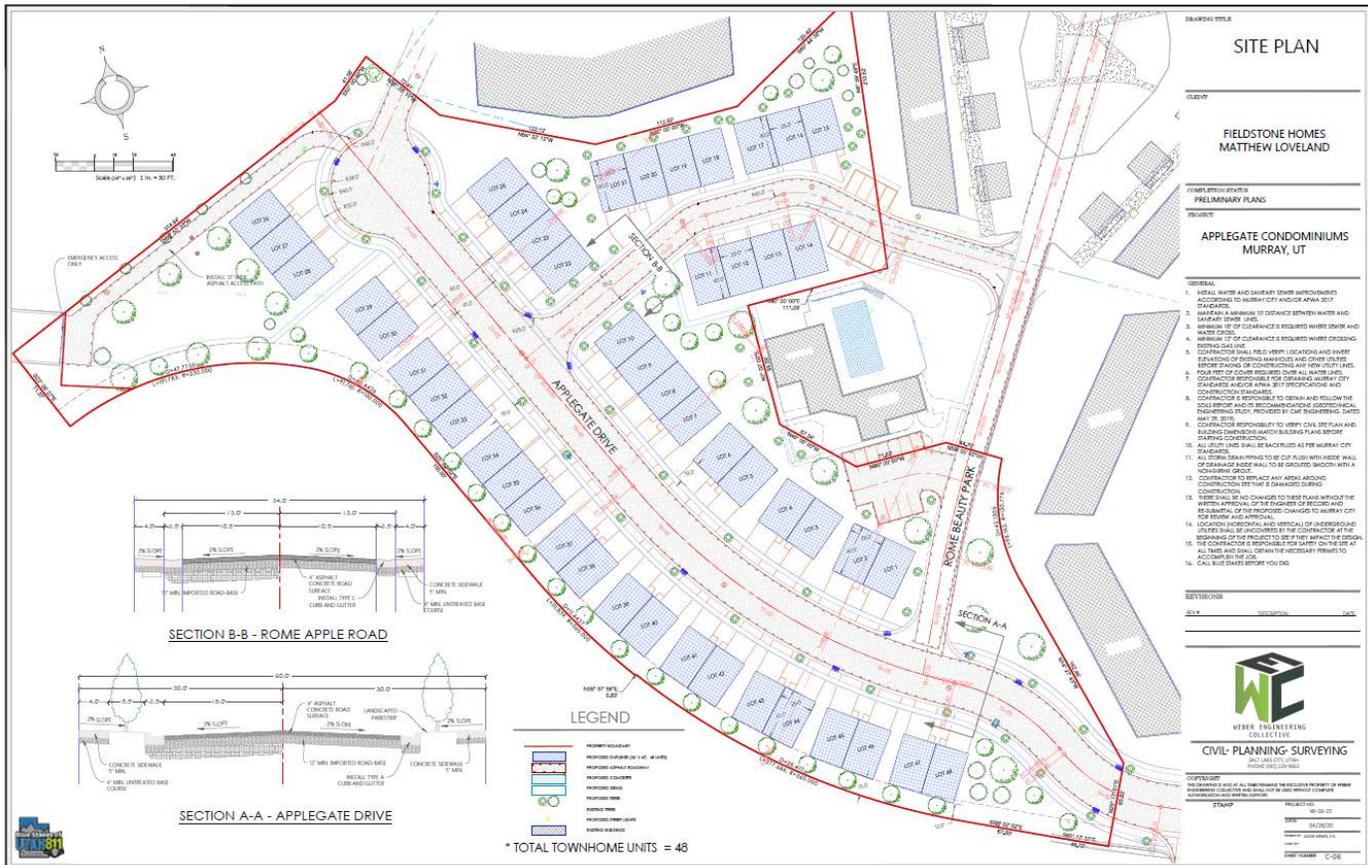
Proposed Applegate Townhomes PUD Subdivision
